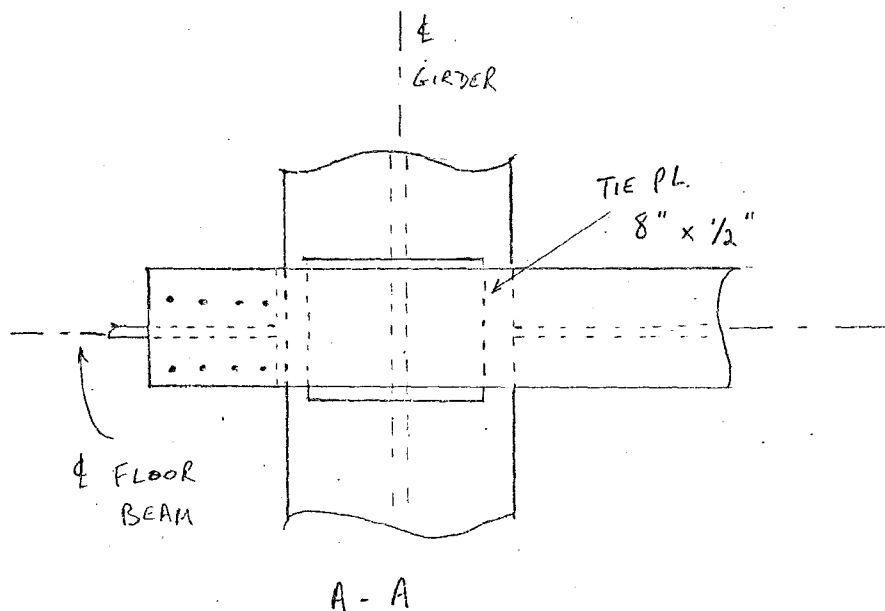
Tieplate Detail at Columbia-Wrightsville Bridge
